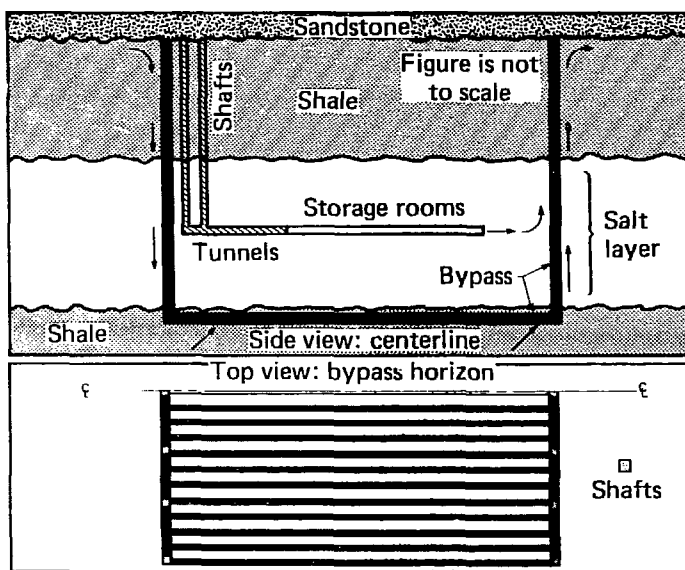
Layout of hydraulic bypass used in alternative design scenario (arrows indicate direction of flow when bypass is used; flows are significantly different from those shown in Fig. 2-2).
